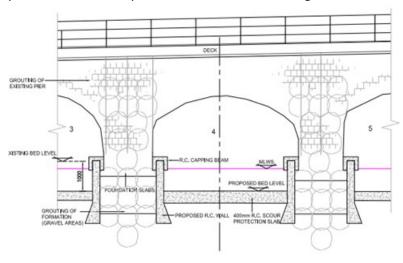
Underpinning by foundation improvement with RC wall around each pier option (Not to scale. Extracted from Drawing No. 1010).
